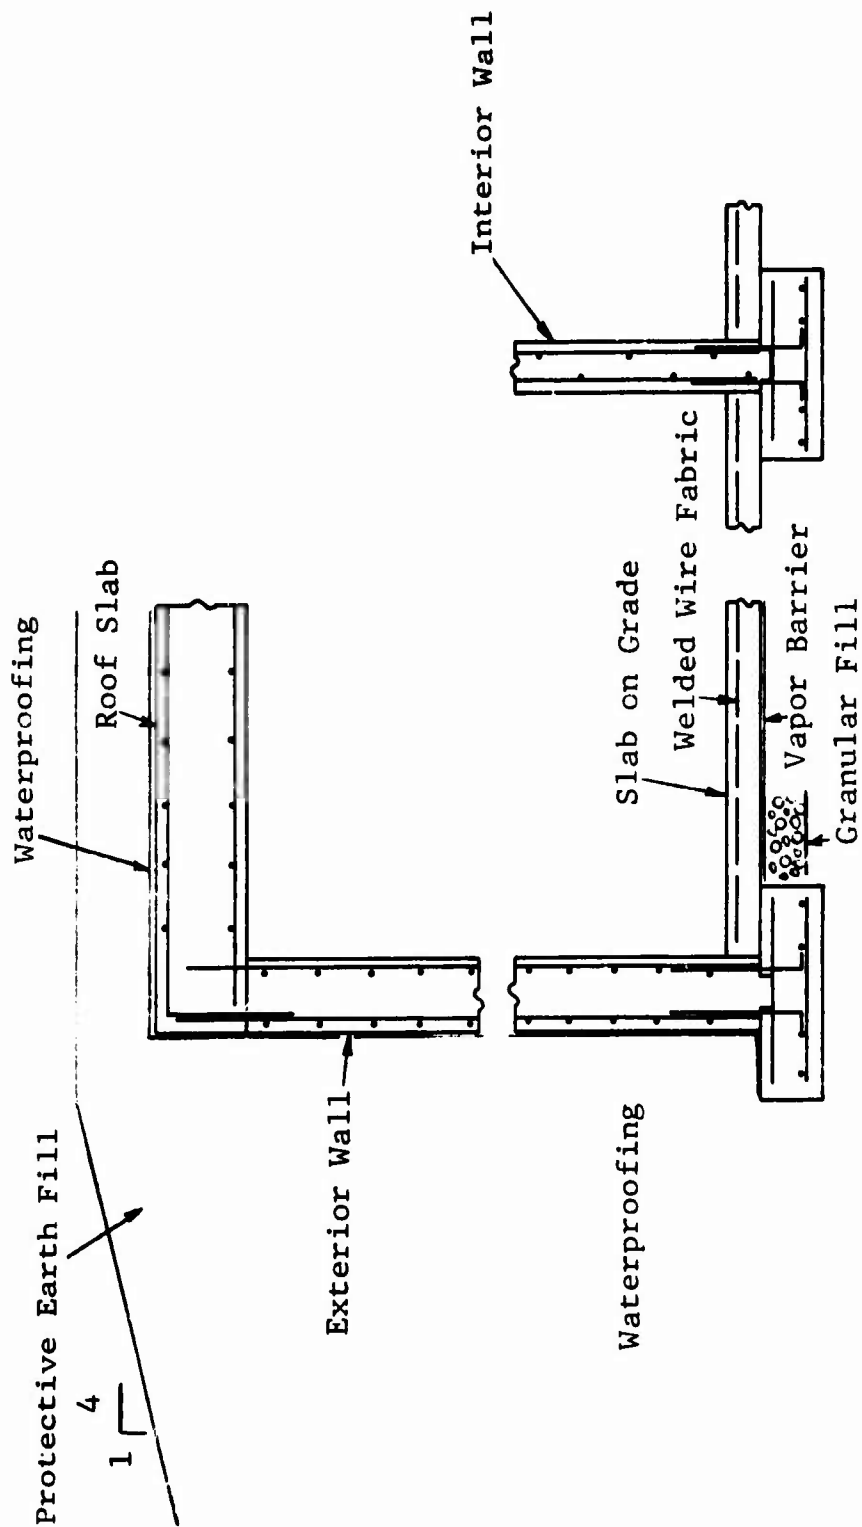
CONSTRUCTION DETAILS OF R/C RECTANGULAR SHELTER
